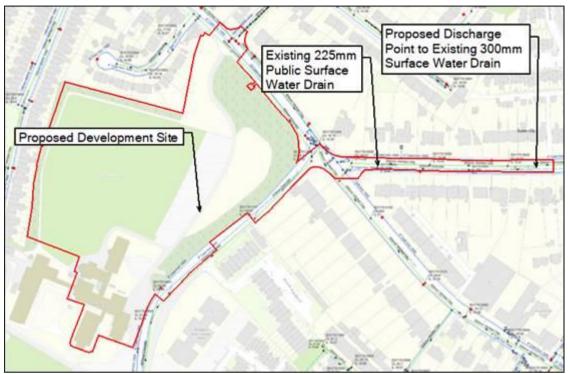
Existing Surface Water Drainage Infrastructure (Source: DBFL, 2021)
